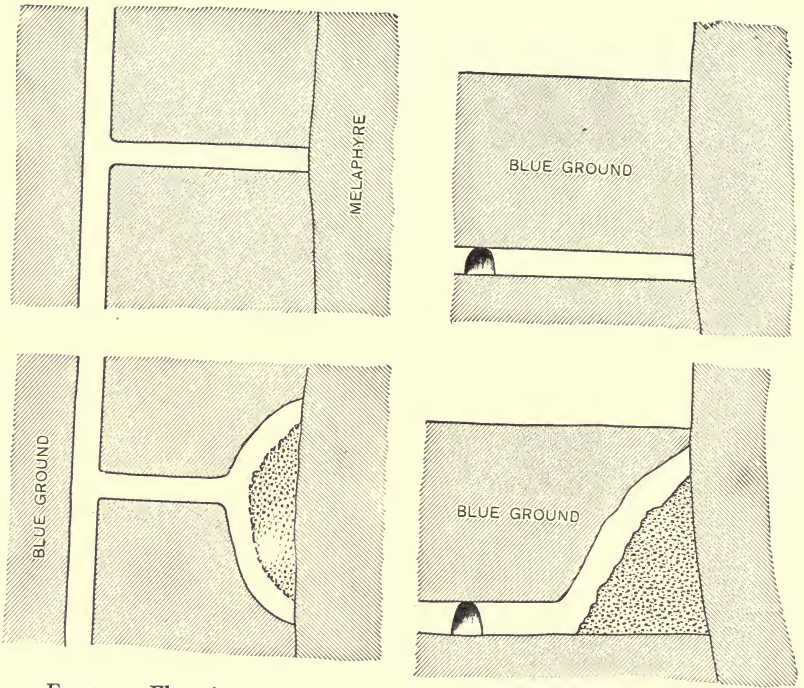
Elevations and Plans, Showing Method of Opening Up a Stope.
